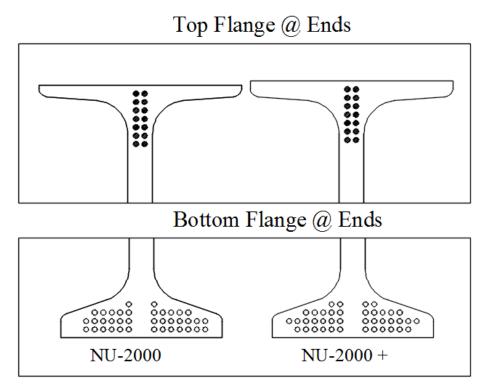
Harped Strand Pattern with 8-ft Spacing @ Maximum Span Length
